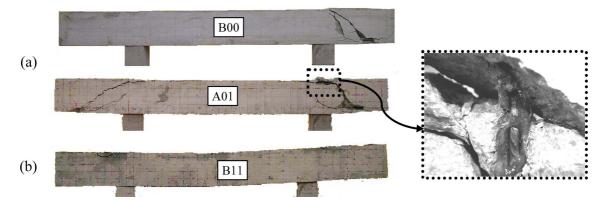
Typical failure condition: (a) shear failure, (b) flexural failure
